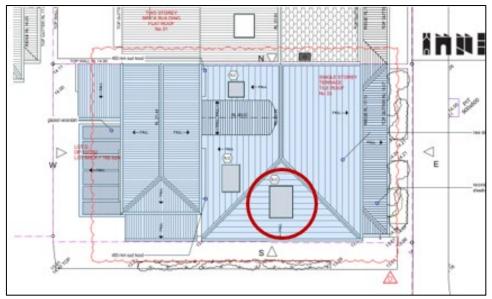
Detail of roof plan (stamped under DA/2023/0219) – subject skylight highlighted in red circle.
